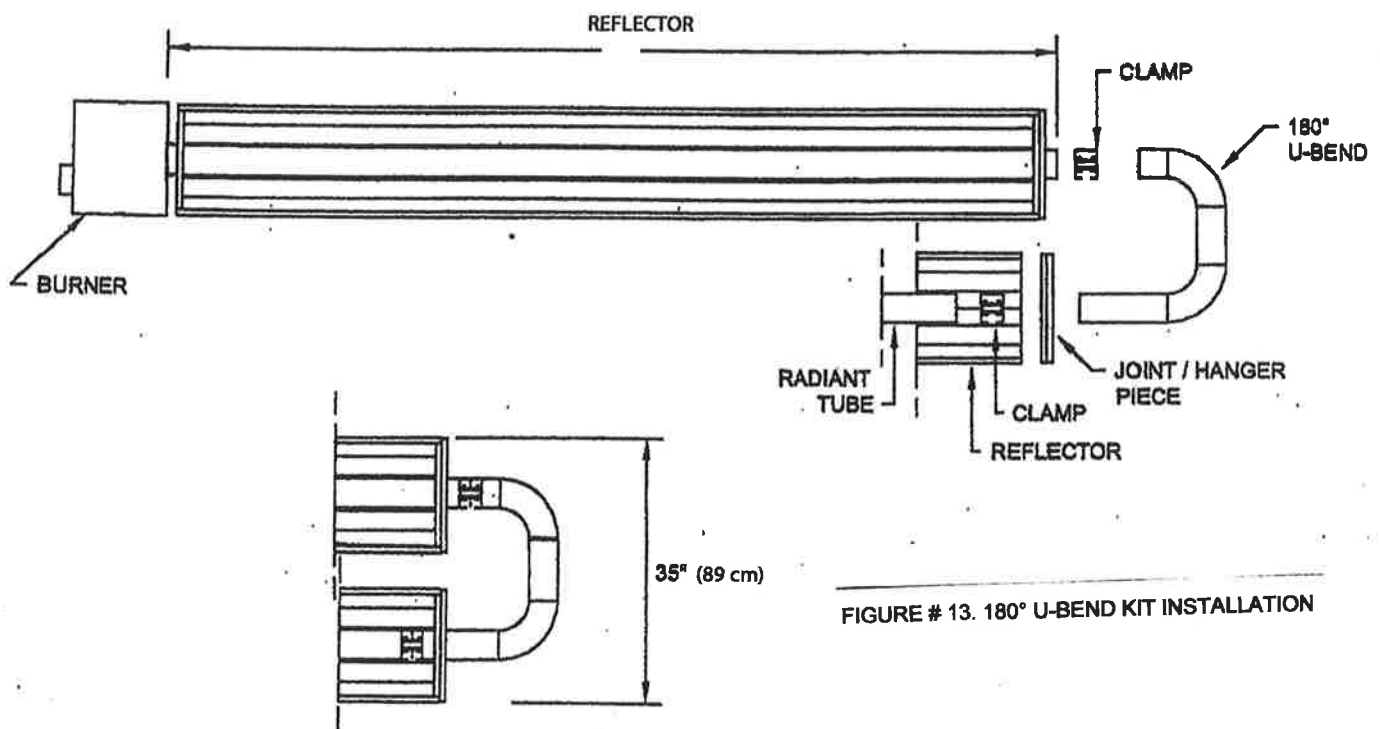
180° U-BEND KIT INSTALLATION
